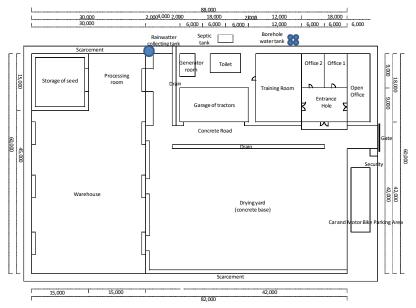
Planned Location of Building Facilities
